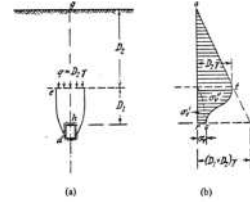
(a) Yielding Zone in Soil When Tunnel Located at Great Depth, (b) Vertical Stress Profile in Soil Located above the Tunnel (Terzaghi, 1943)
